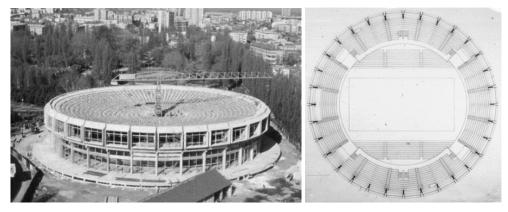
The Sports Hall Cair in Nis nearing completion (left); and building's plan (right) (UB-FA Archives)
